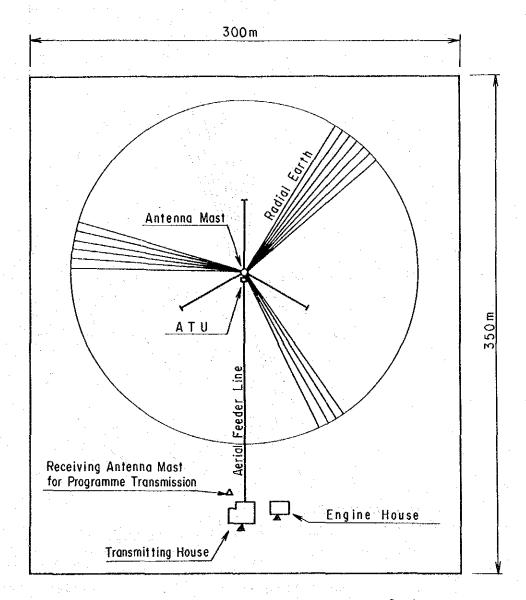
Bukittinggi Transmitting Station; Site Plan
